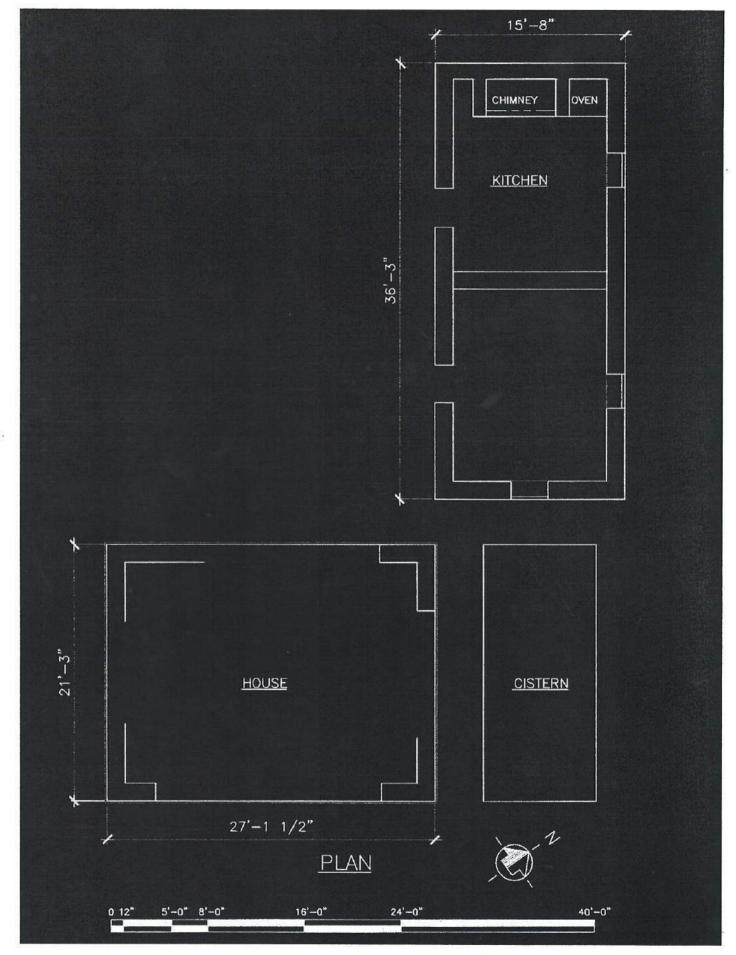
Ruins at Lantern Head, Abaco. Sketch plan of house and outbuilding.
